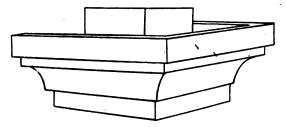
Molded Face Gutter, or Eave Trough Miter.
